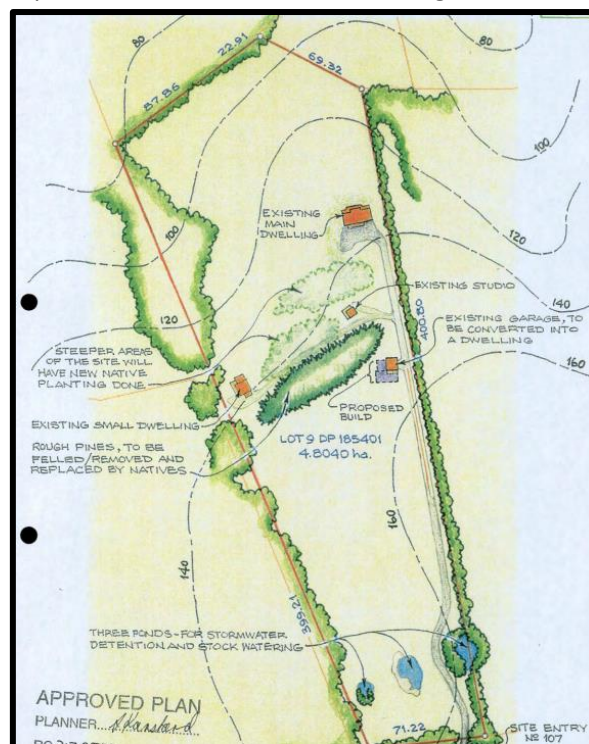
Approved plan under RC2170500 showing location of existing buildings on the site.
